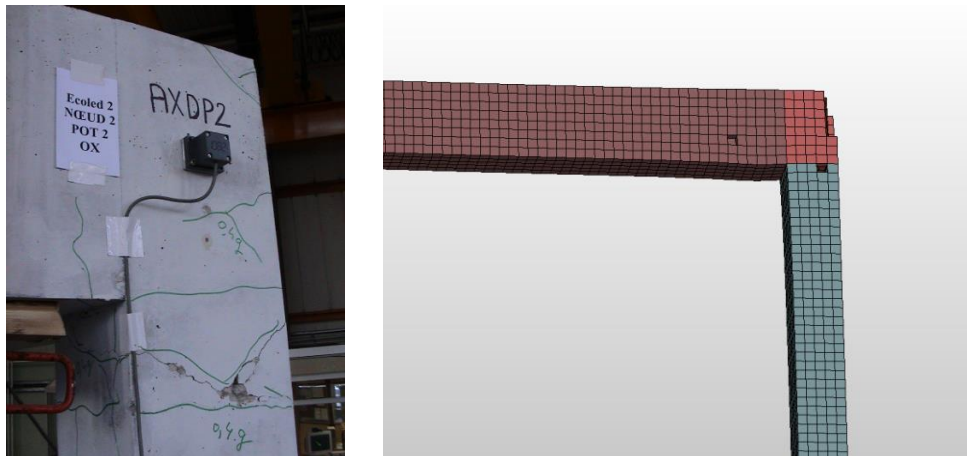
(On the left) top floor left connection cracks and spalling of concrete observed in the experiment, (on the right) cracking/spalling of concrete by means of erosion in LS-DYNA simulation
